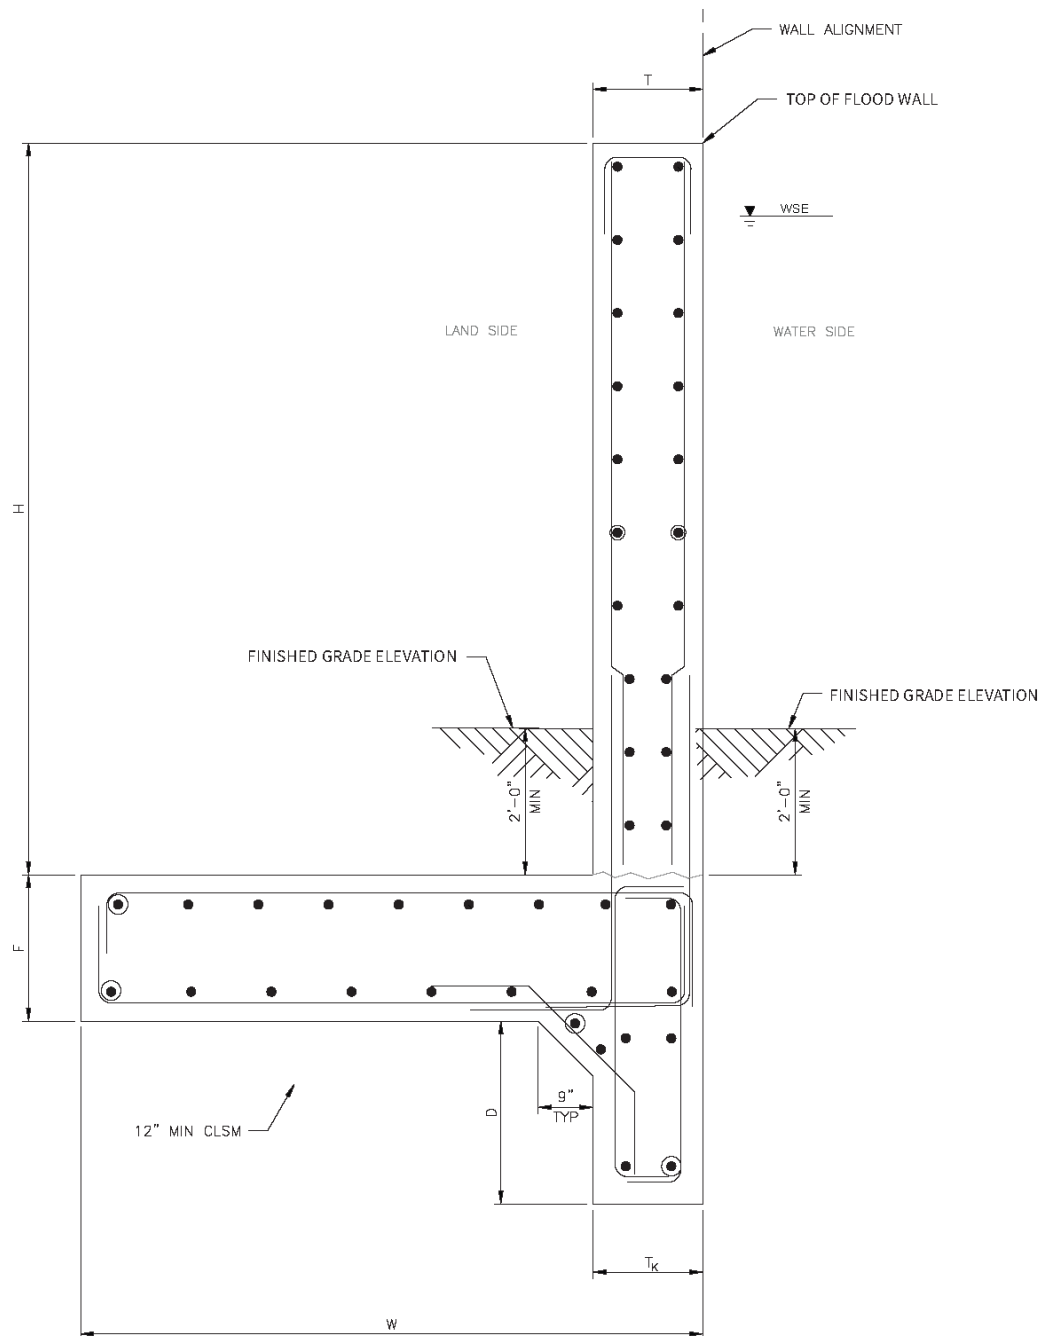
Typical Concrete L-Wall Floodwall Cross Section
